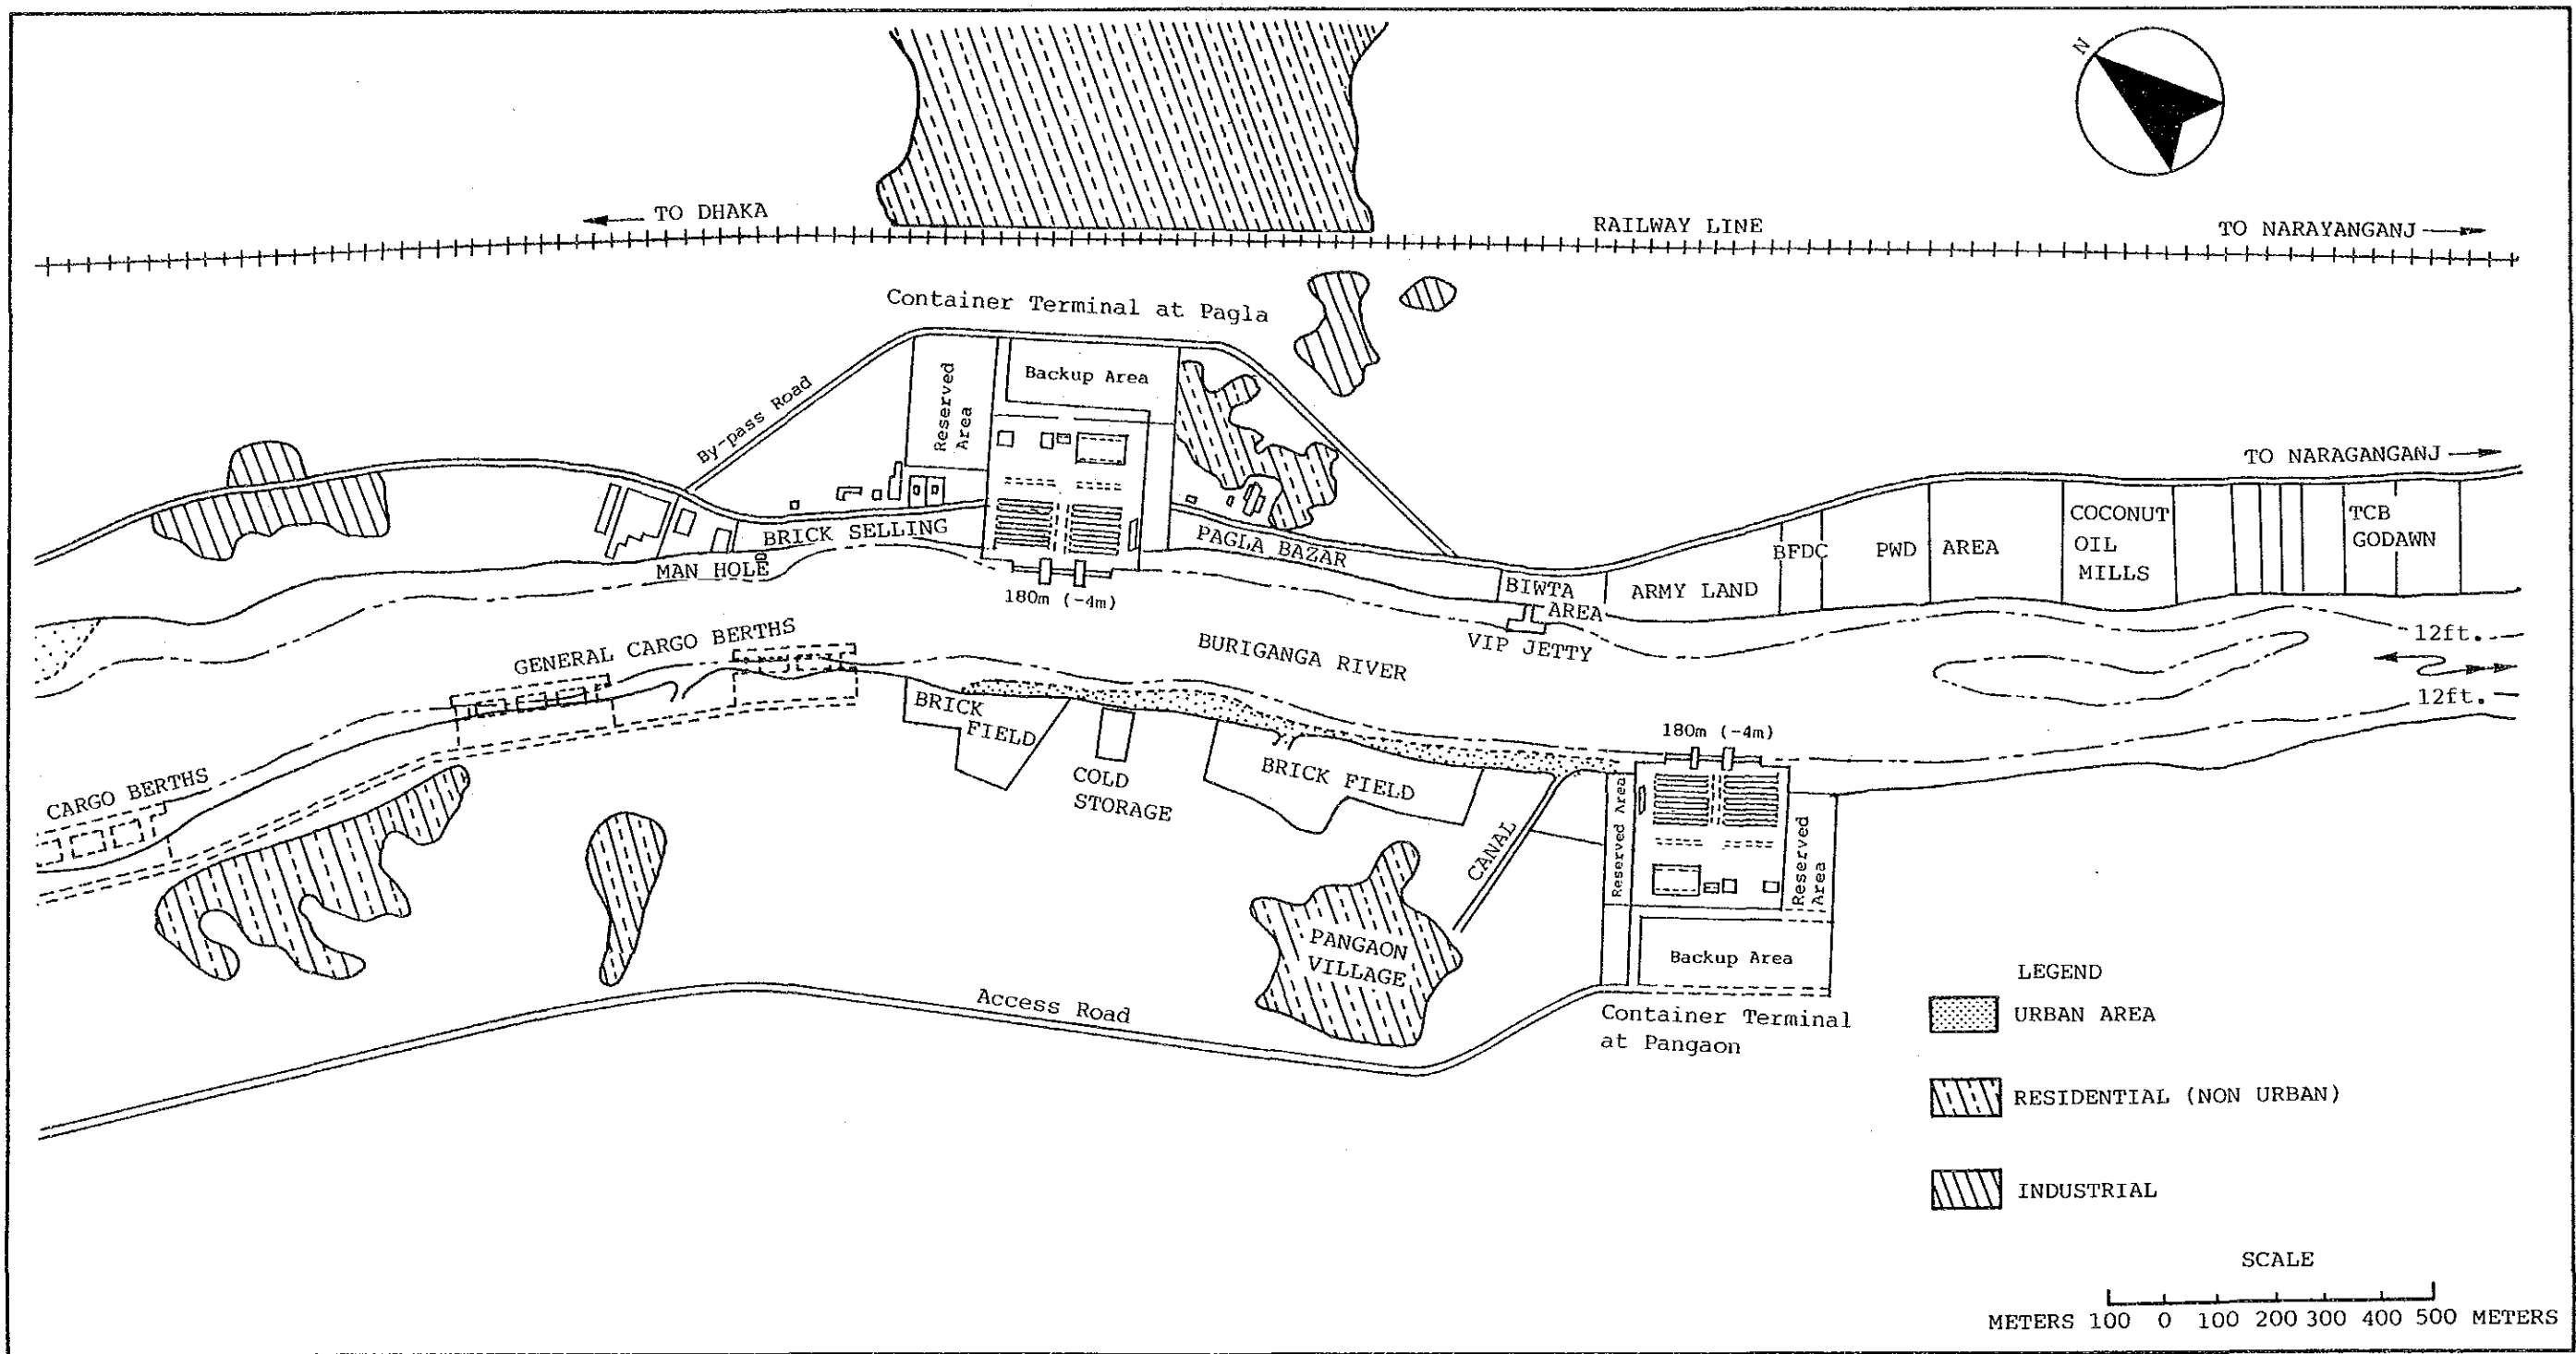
Alternative Development Plan at Pangaon and Pagla Site - Case 3
